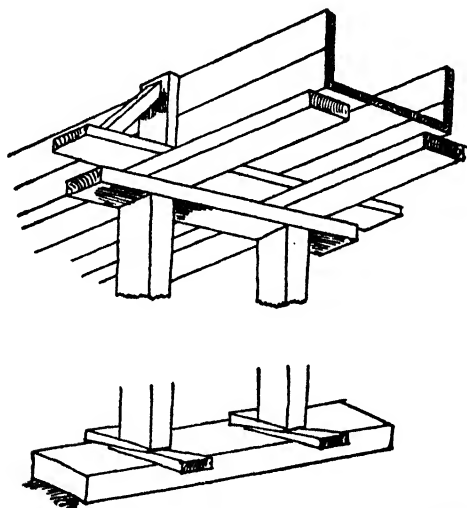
Casing and supports for a reinforced concrete beam in an upper floor.
